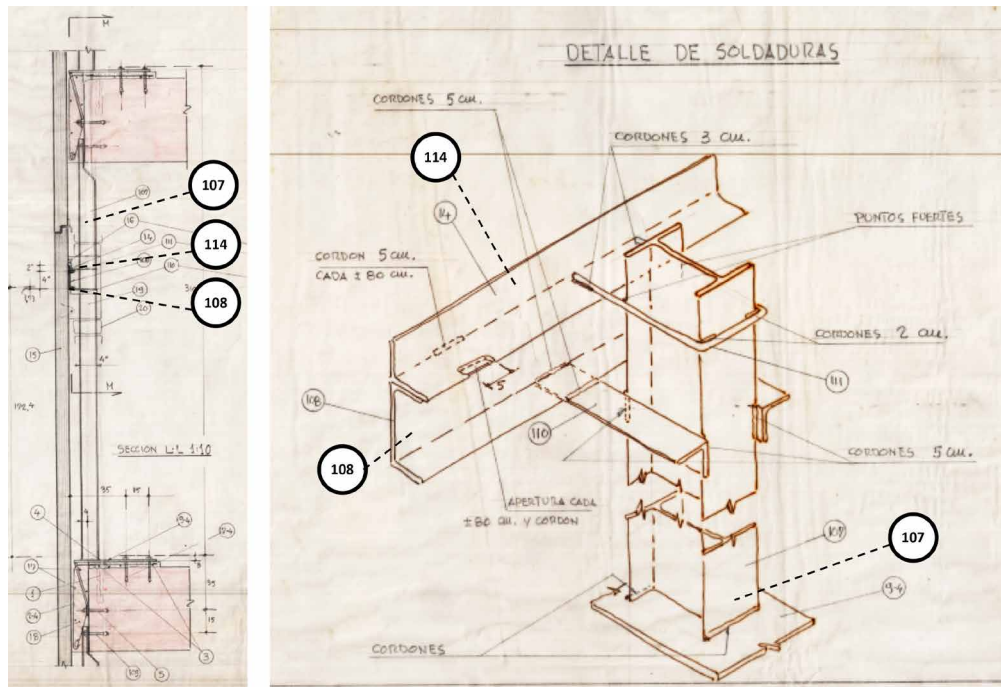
Constructive detail of the North Tower's façade and welding detail of the supporting metal profile, 1986. (Source: Archivo Doménico Parma, Universidad de los Andes).
